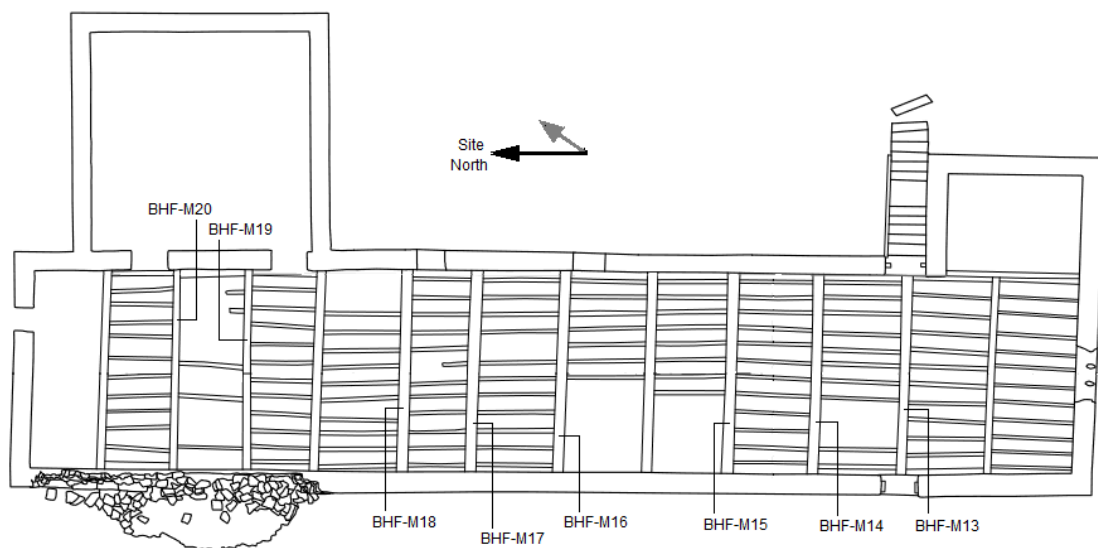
First-floor plan, showing the location of sampled timbers BHF-M13–20 (Archeritage for Pearce Bottomley Architects)
